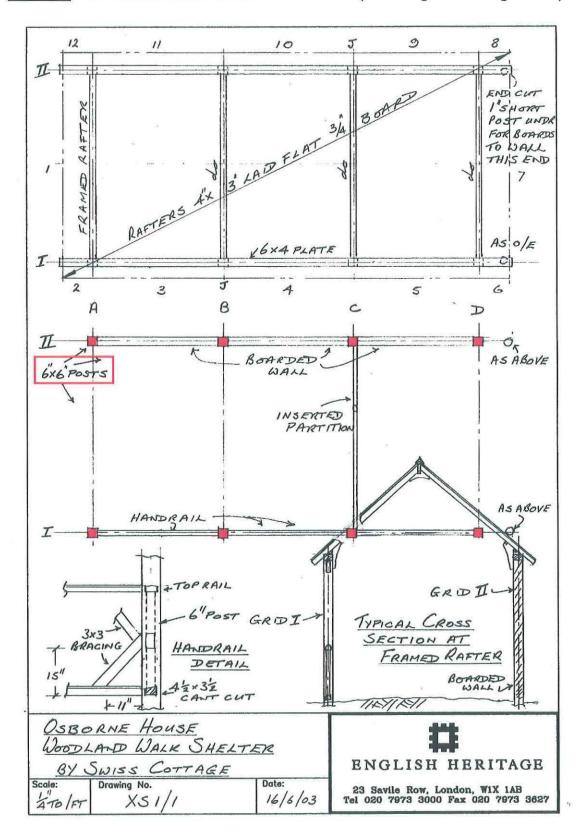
Plans and sections of Summer Pavilion (after English Heritage 2003)
